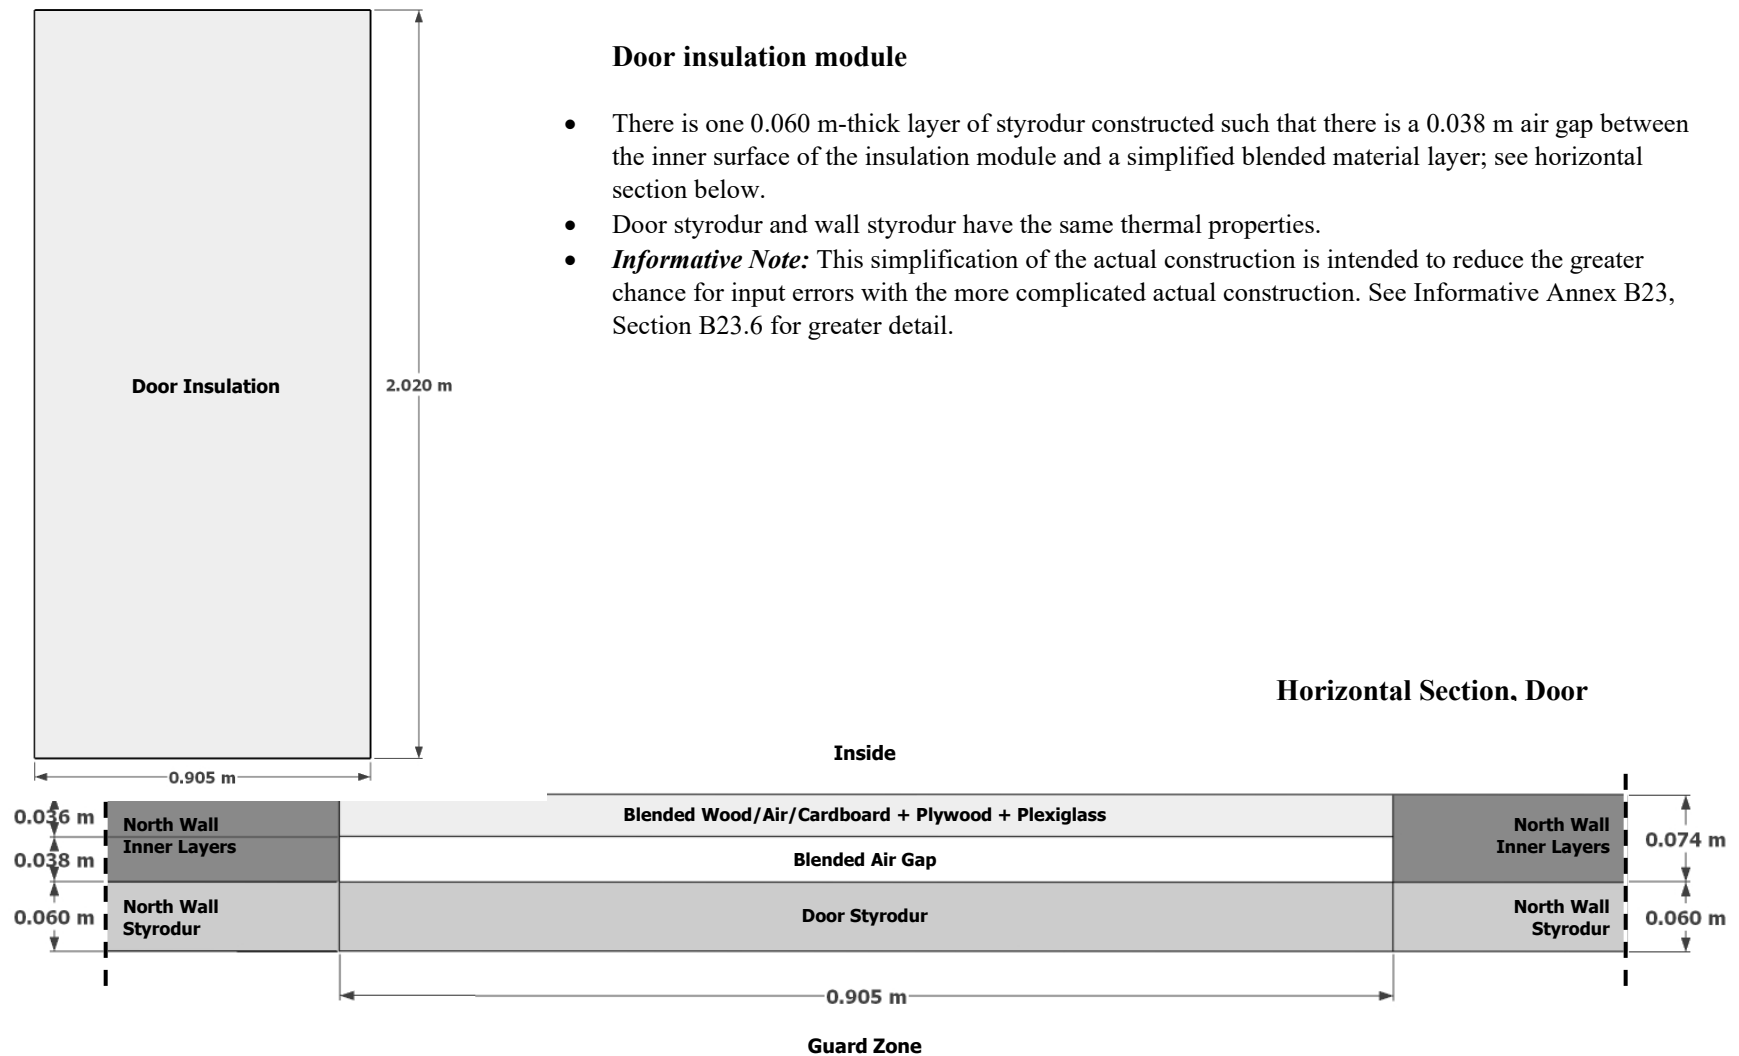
Door within north wall including insulation (styrodur) and air gap between insulation and door
